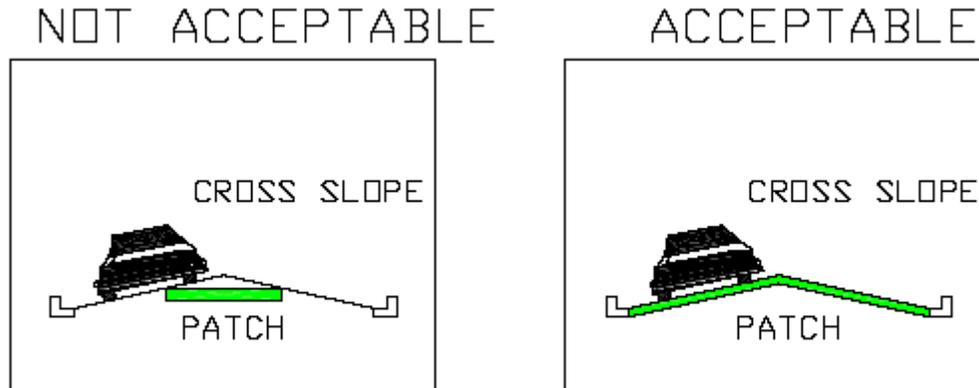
Example 11. Patch slope and grade must match existing pavement.
